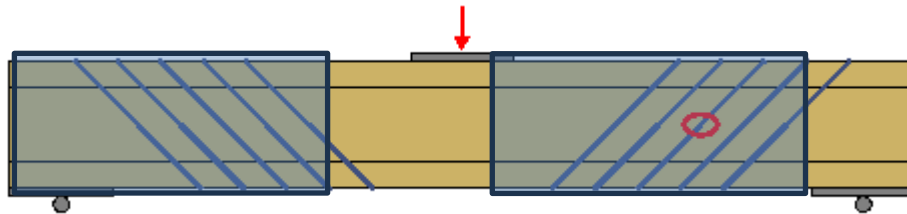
Timber member with shear reinforcement; shaded areas: reinforced areas with screws arranged under 45°
